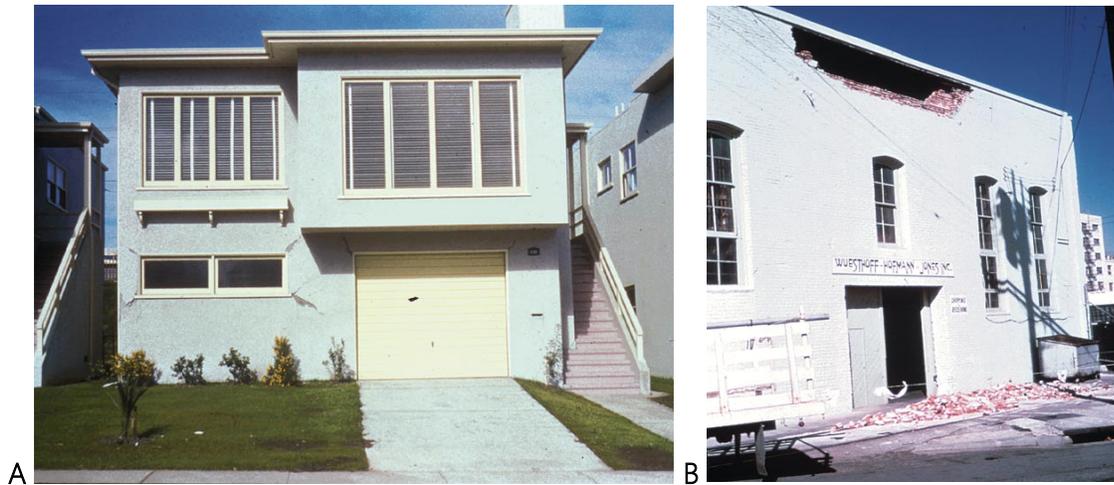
Many damaged buildings can be safely occupied. (A) A wood-frame dwelling with cracked stucco at door and window corners would probably be evaluated green, “inspected.” (B) An unreinforced masonry warehouse with parapet damage over one of several entrances could nonetheless be used if the entrance beneath the damaged parapet were not used. (Images: public domain)
